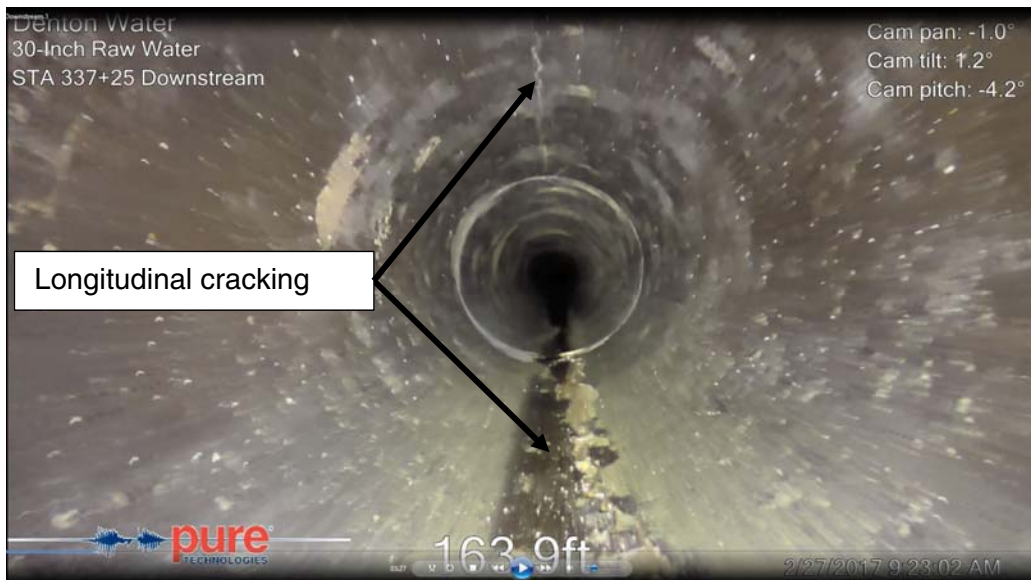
Pipe 2652, Longitudinal cracking along invert and crown
